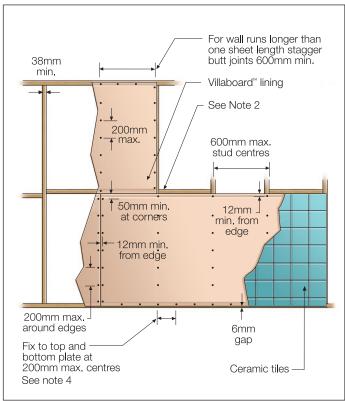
FASTENER / ADHESIVE FIXING TO WALL FRAMES
